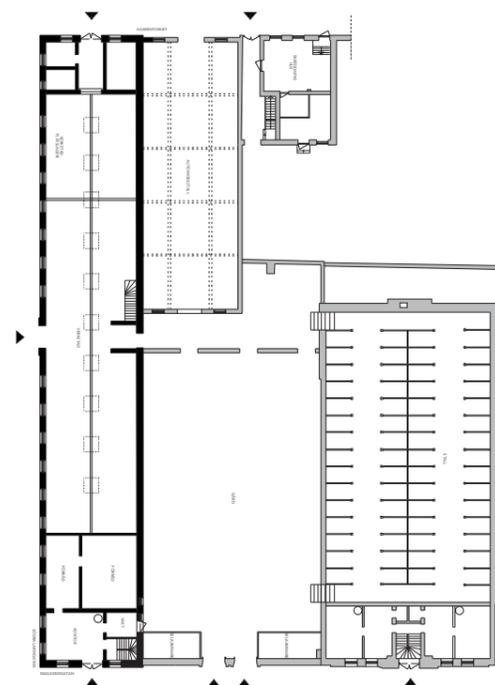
1917. The windows became bigger when the stables towards Södra Larmgatan were turned into a workshop.
